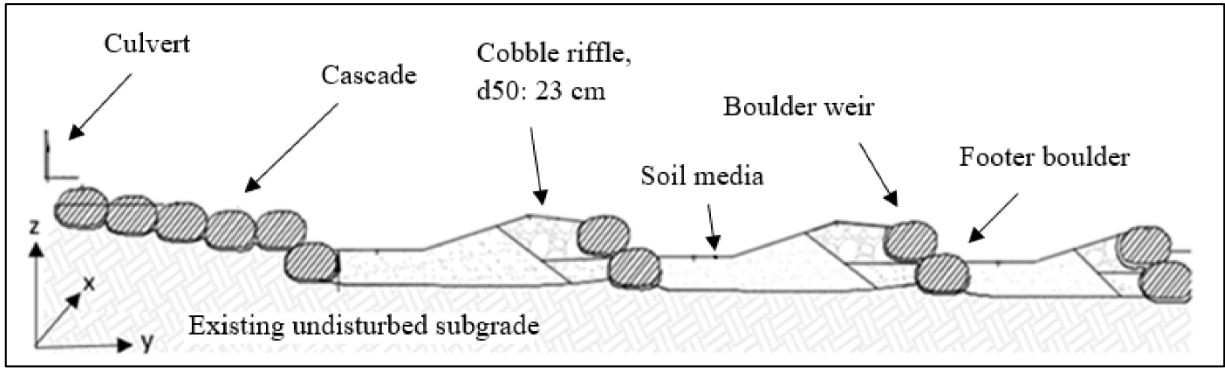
Longitudinal cross section of Regenerative Stormwater Conveyance.
